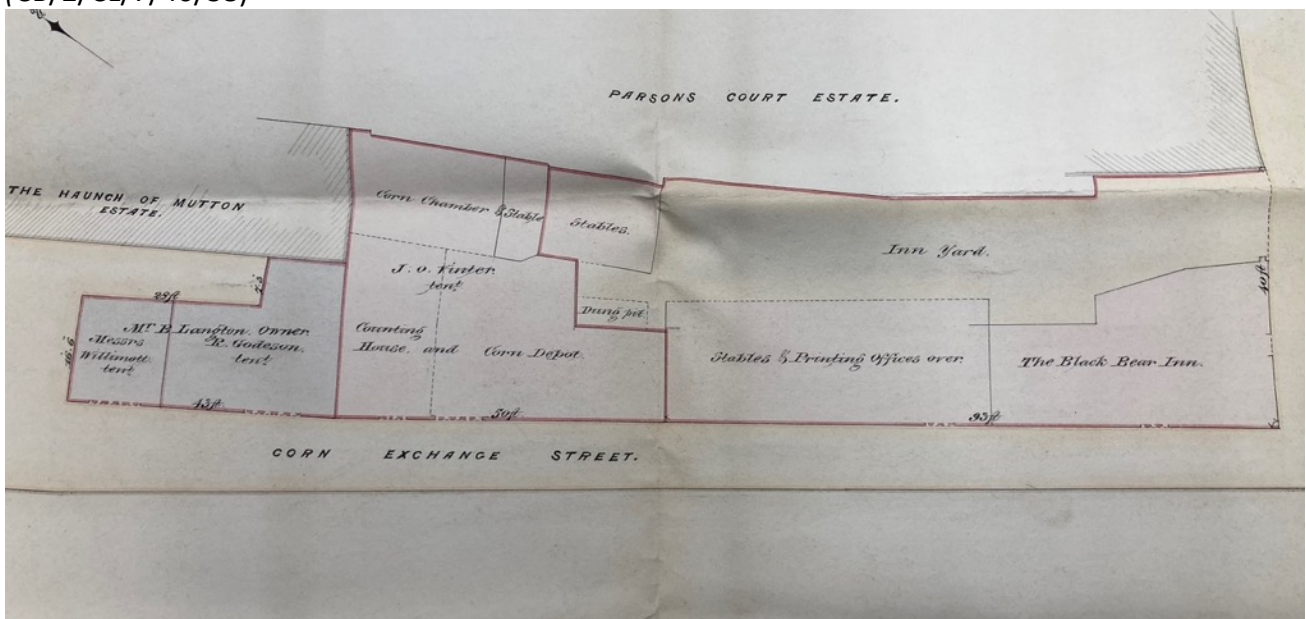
St Andrew's Hill site. Plan of proposed site for New Corn Exchange by R Reynolds Rowe, town surveyor. April 1869 (CB/2/CL/7/40/60)
